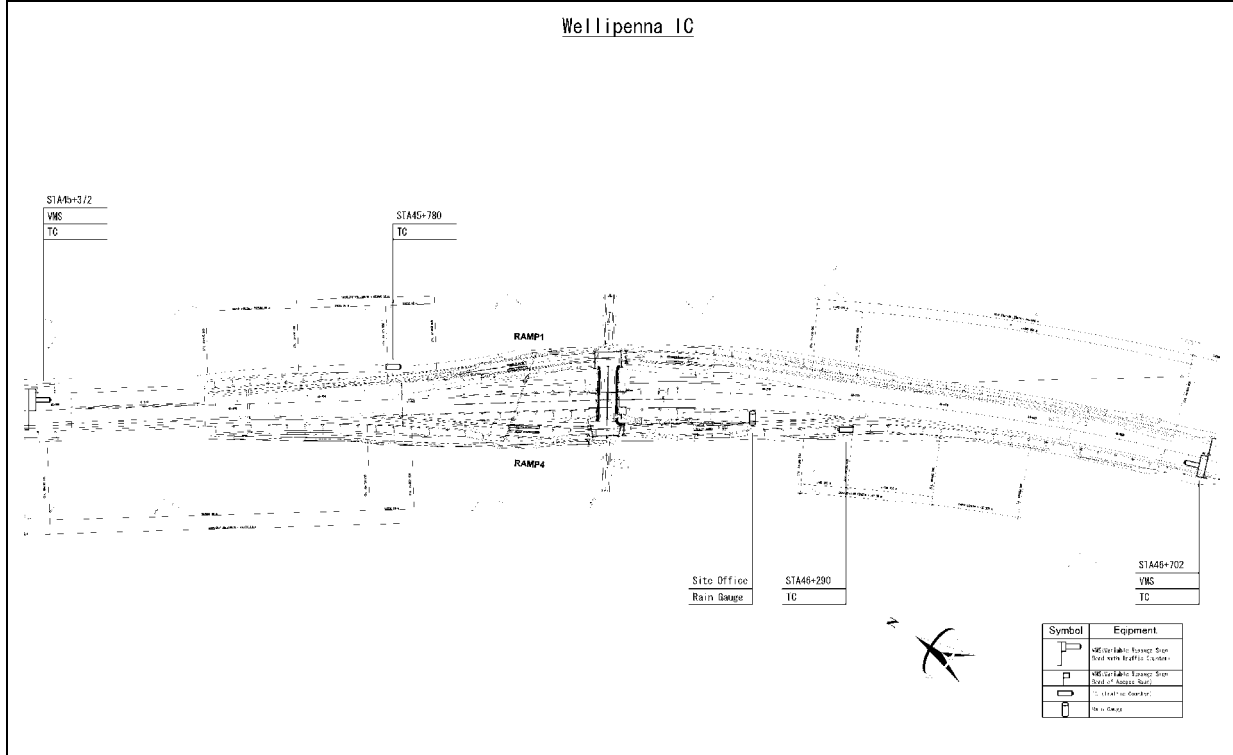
Road side equipment layout plan (Welipenna IC)
